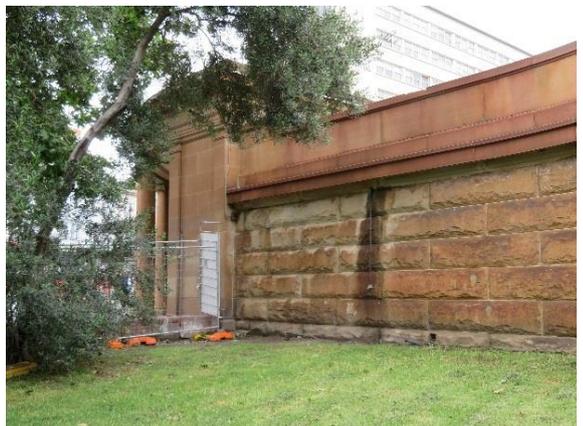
Detailed view of the sandstone boundary wall and the approximate location where the underboring is to occur. Note the Elizabeth Street entrance to Central Station at the left. (Source: GML 2018)
